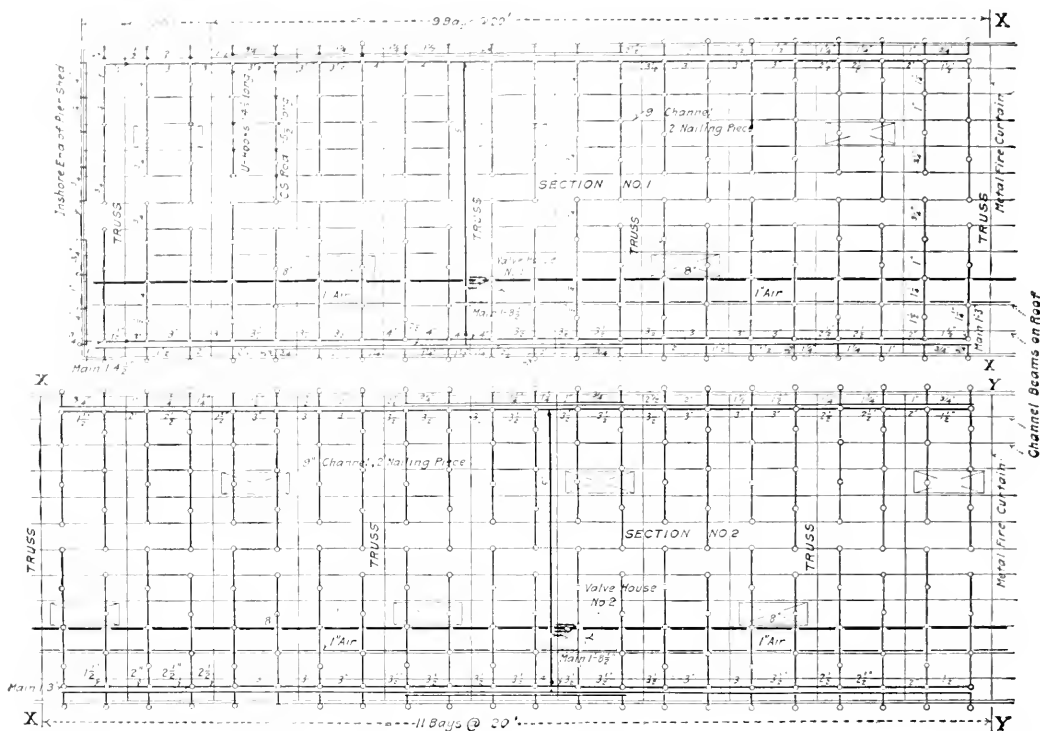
SPRINKLER LAYOUT FOR A TYPICAL PIER PROPERTY (SEE CONTINUATION IN FIG. 4). NOTE PARTICULARLY THE OPEN SPRINKLER EQUIPMENT TO GUARD AGAINST EXPOSURE FIRES
